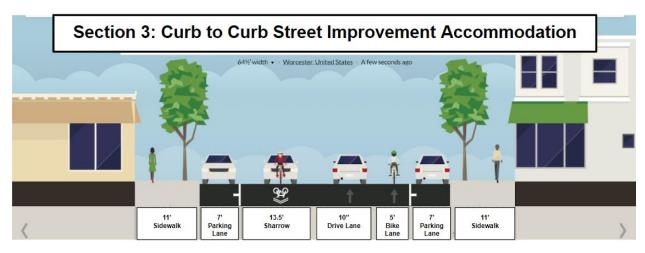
Curb to Curb Street Improvement Accommodation, Section 3
